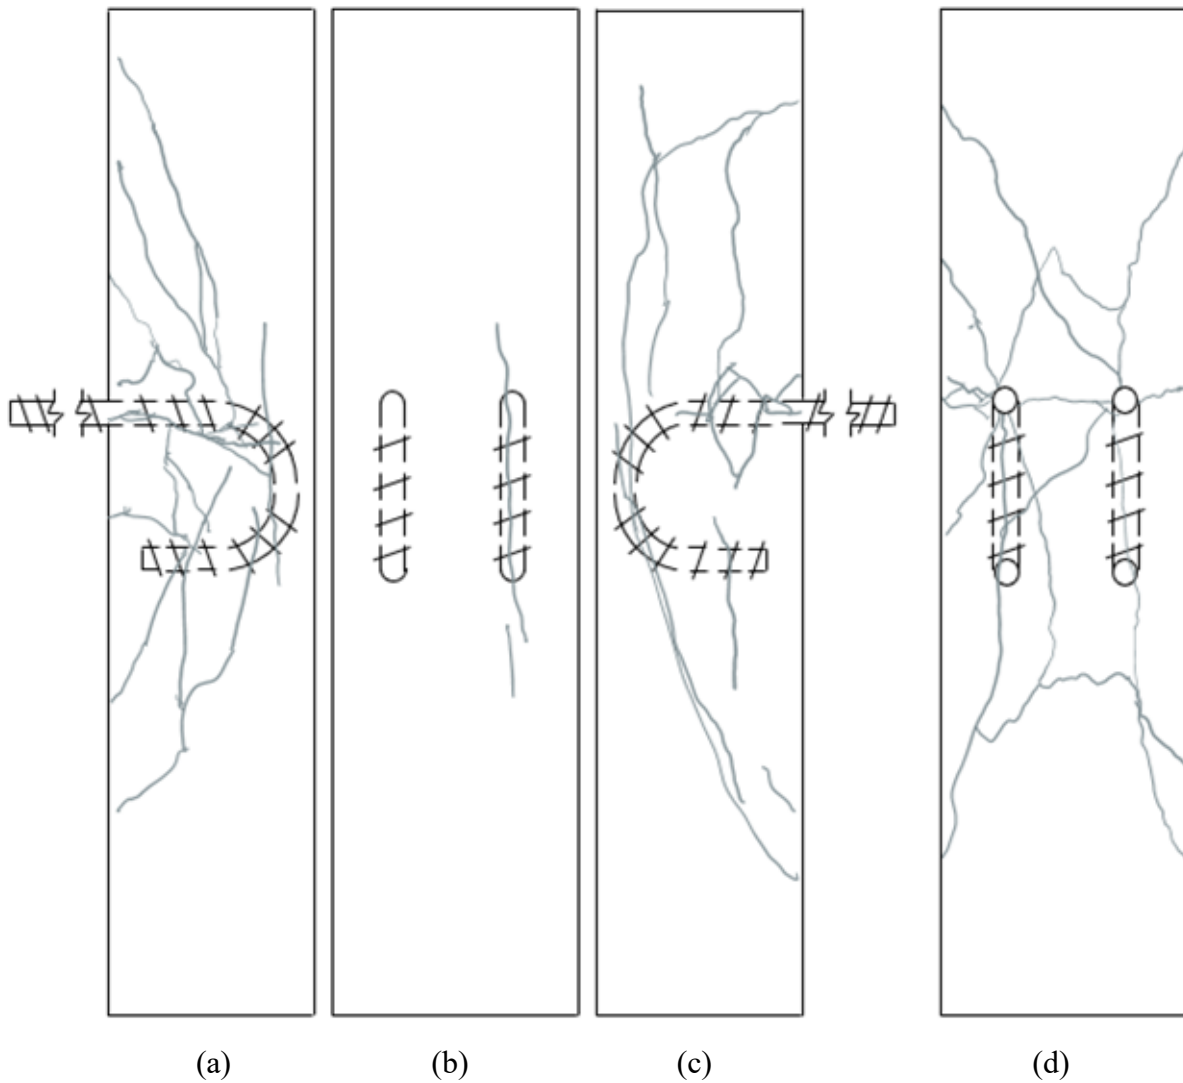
Crack pattern at maximum normalized tensile load for beam-column joint specimen MD3-180: (a) west side face, (b) back face, (c) east side face, and (d) front face
